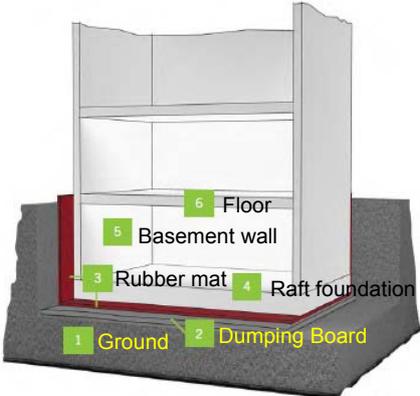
Sketch of floating building by adding a layer of rubber elastomer mats under the raft foundation
